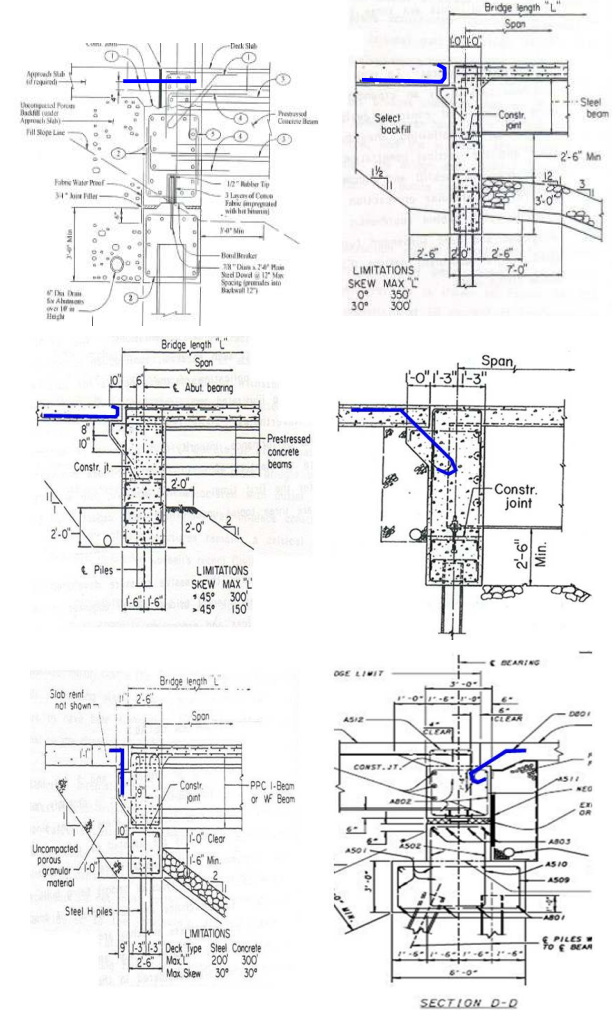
Design Details of Rebar Connection of Approach Slab in Typical Integral and Semi-integral Bridge
